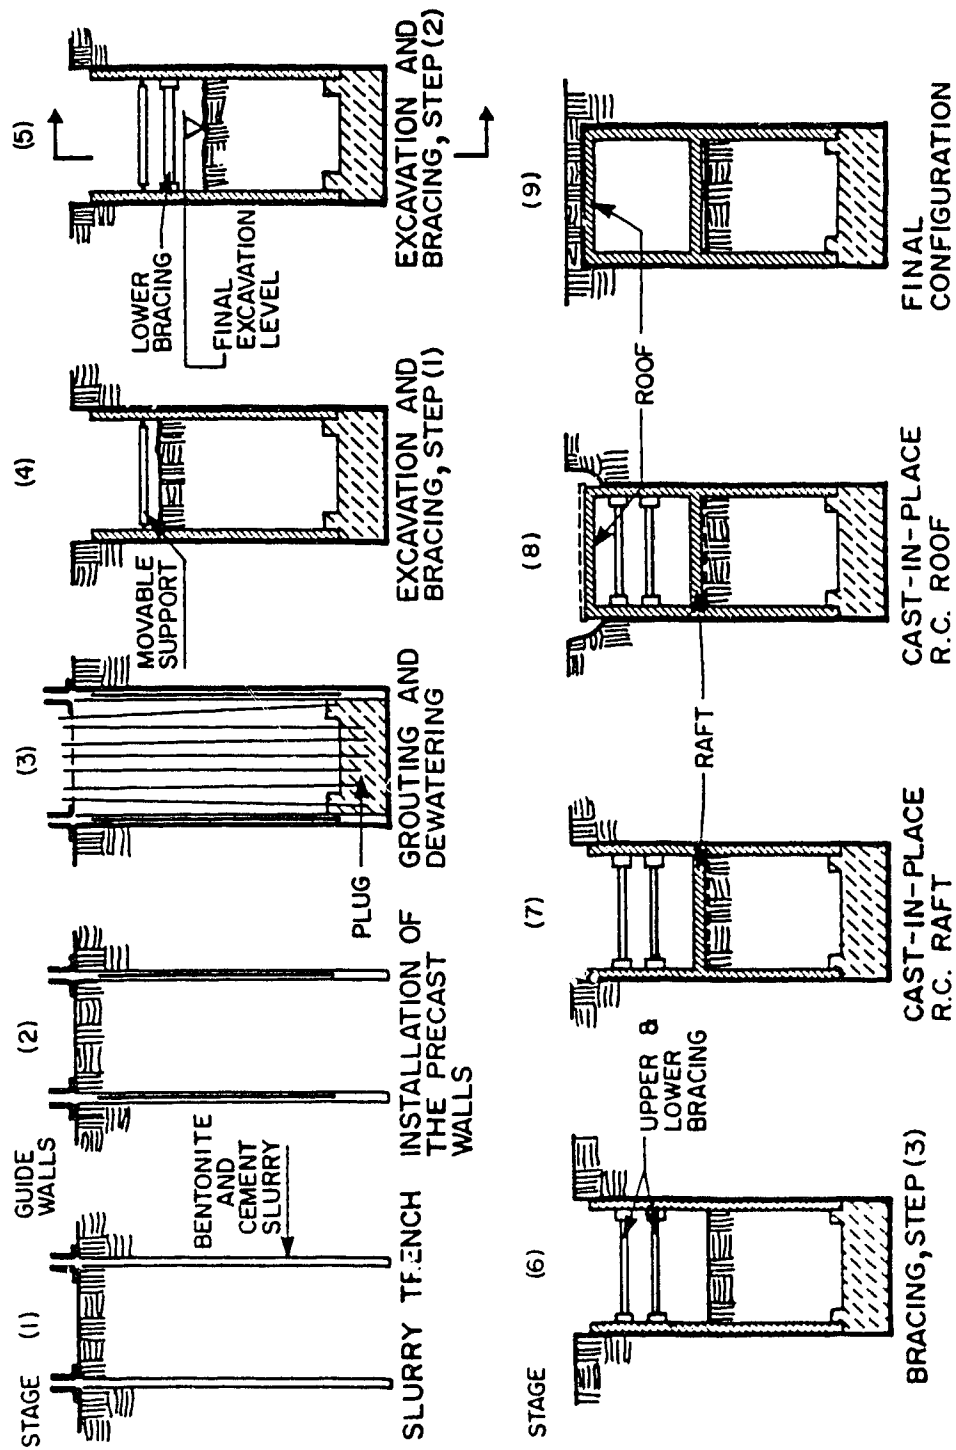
Construction Procedure Steps for the Run and Post Section
